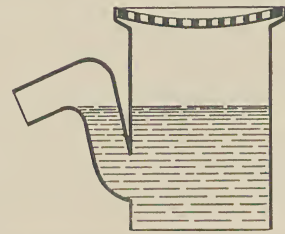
Section of Old-fashioned "Cesspool" Gully.
